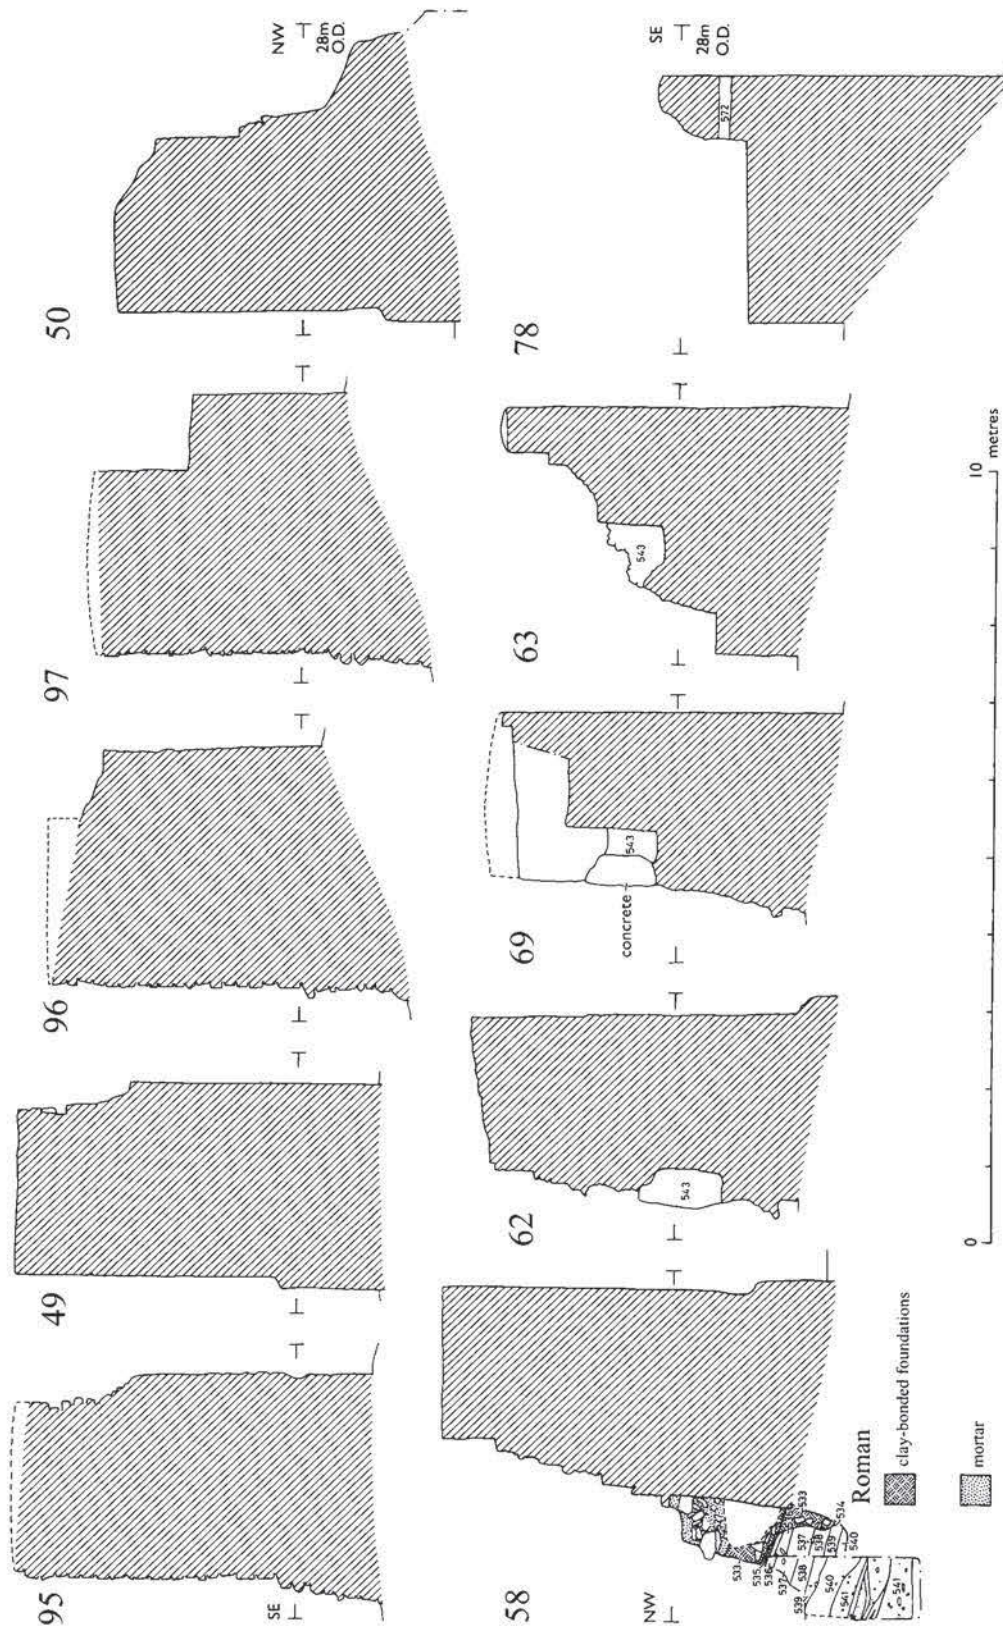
Western Way-Watergate sections 1. Scale 1:100.
